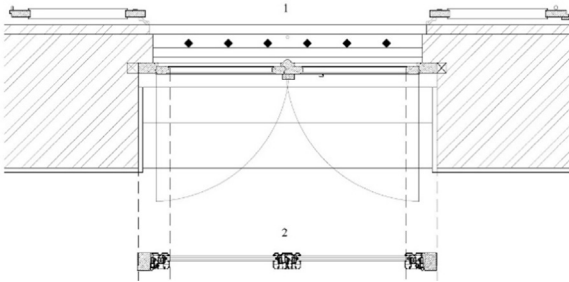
Plan view of existing window at the basement level (1) and example of (aluminium) replacement window with timber sub frame (2); the dotted line indicates visual profiles alignment.
